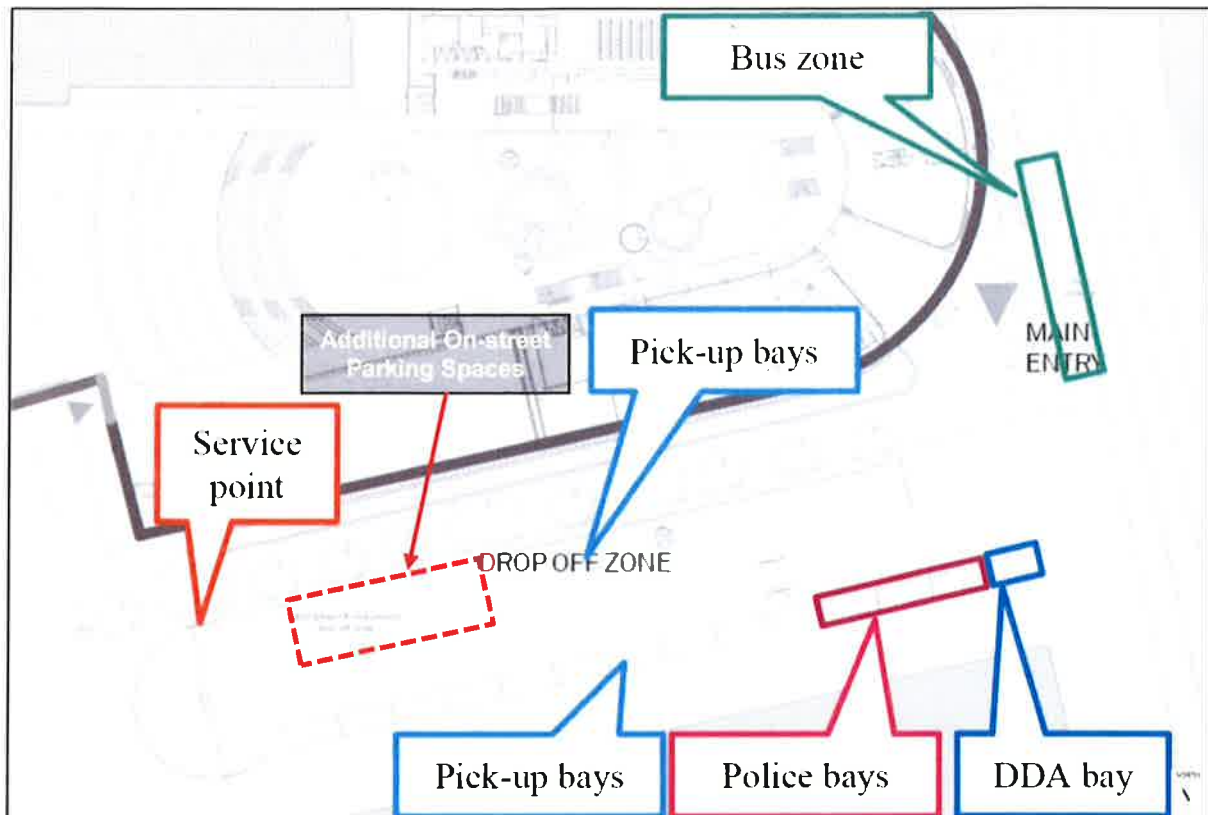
Proposed on-street parking arrangement (source: Applicant)
